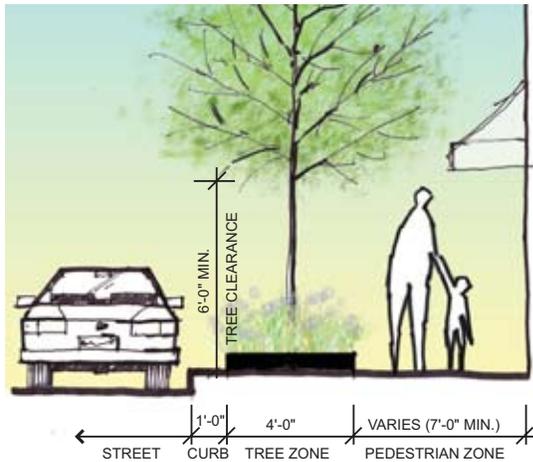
elevation of typical sidewalk with street tree in planter
